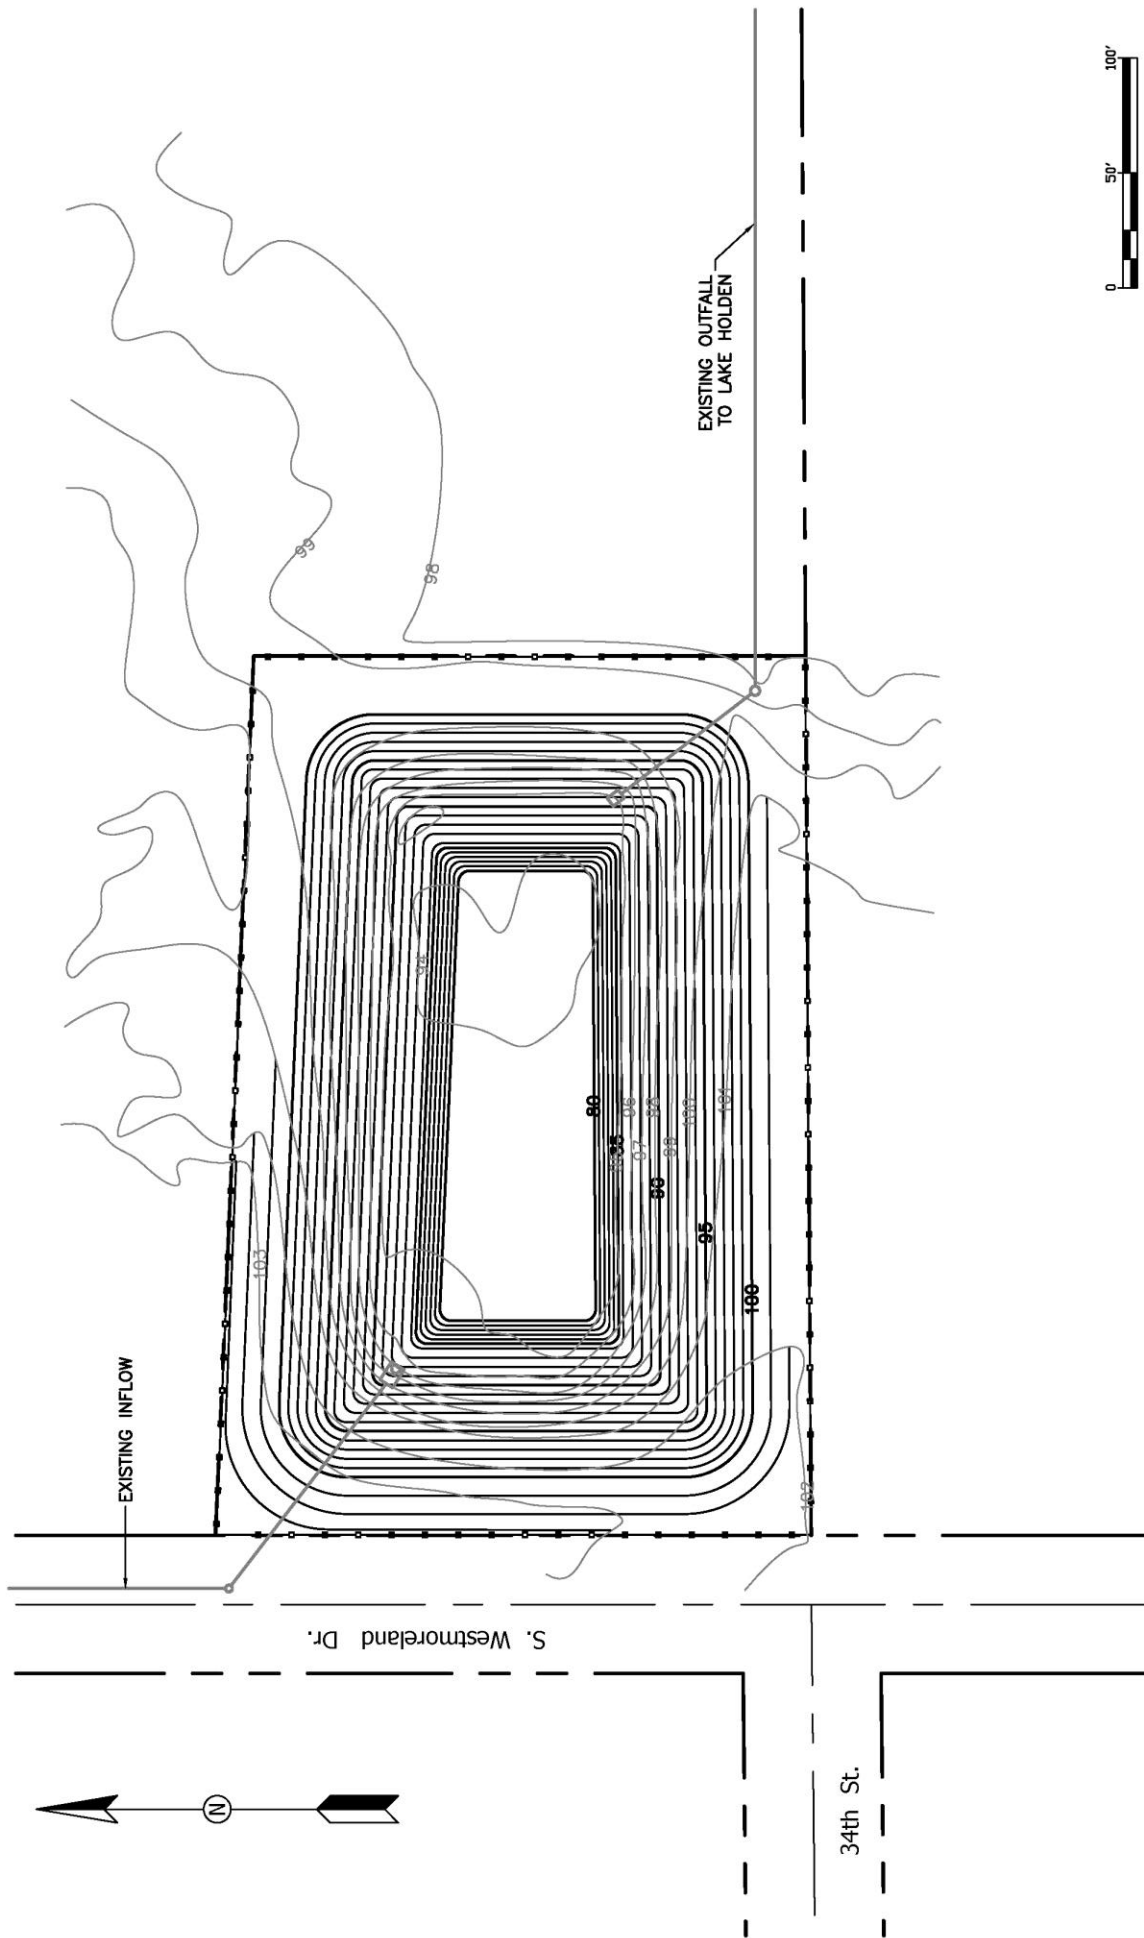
Overview of Proposed Pond Enhancement for Sub-basin B-19.
